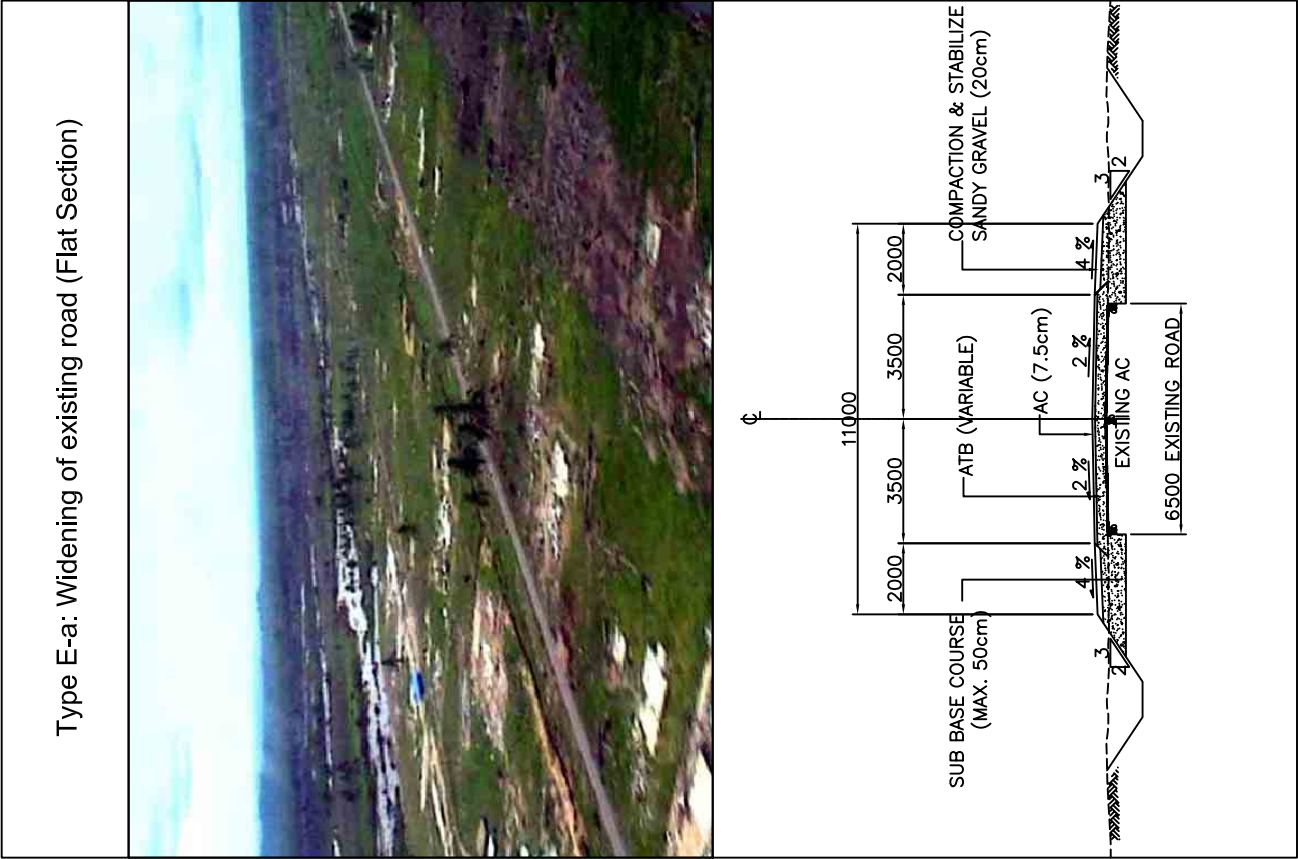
(1/5) TYPICAL CROSS SECTIONS
